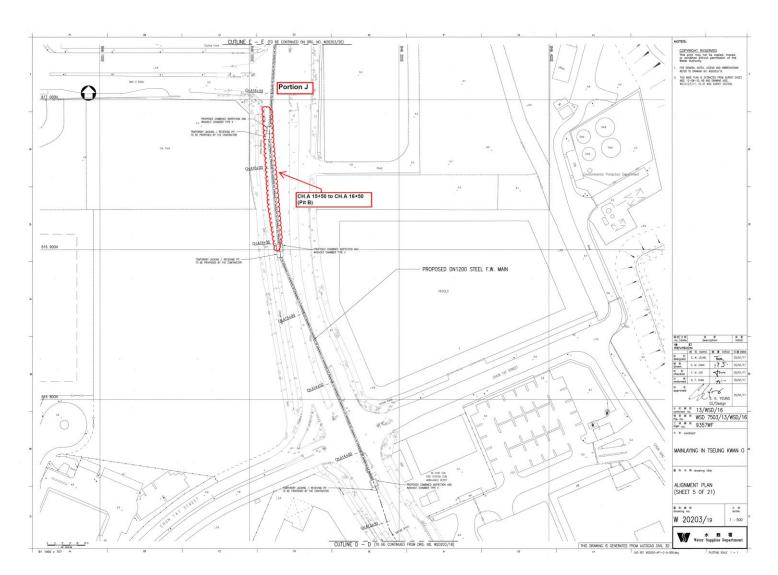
Location Plan for Portion J – CH. A15+50 to CH.A 16+50 (Pit B)
